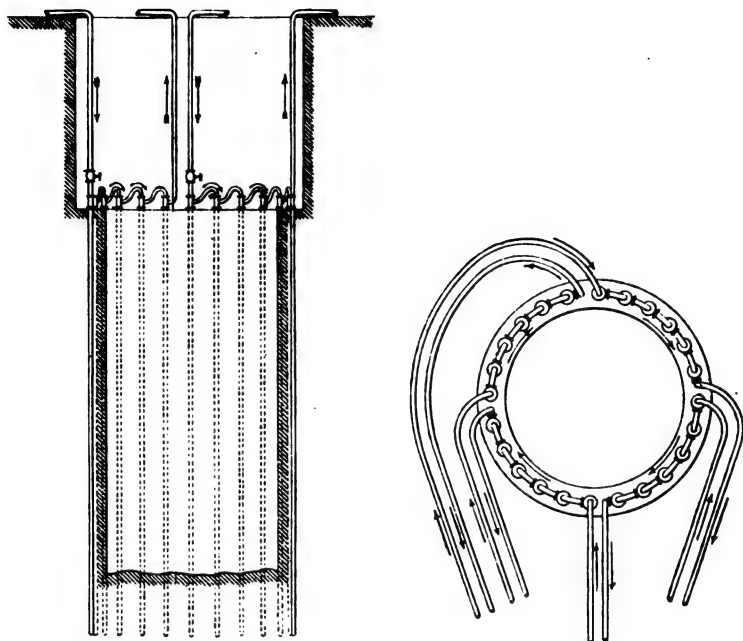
Arrangement of Freezing Tubes adopted at Washington Colliery, Durham.
